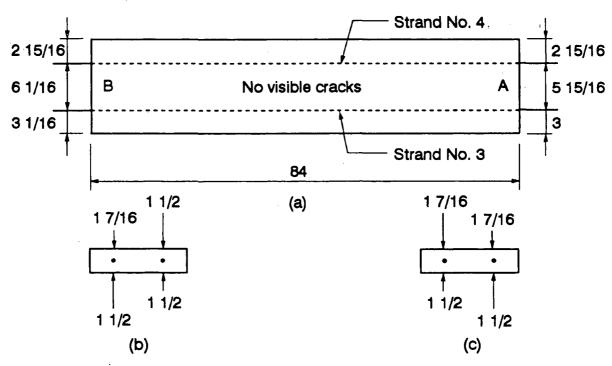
Specimen No. 4-3.0TC-2 (dimensions shown in inches):
